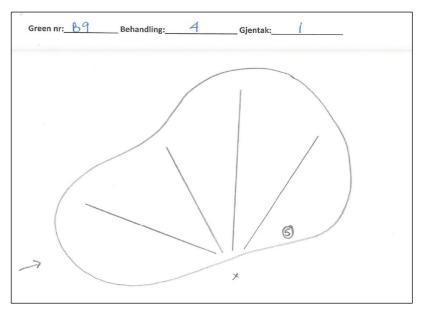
Sketch of drainage pipes installed on green 'Blue 9' at Haga GC. Placement of blower for ventilation (x) and hole cup with sensors (s) are indicated. Drawing: Gavin Jagger.
